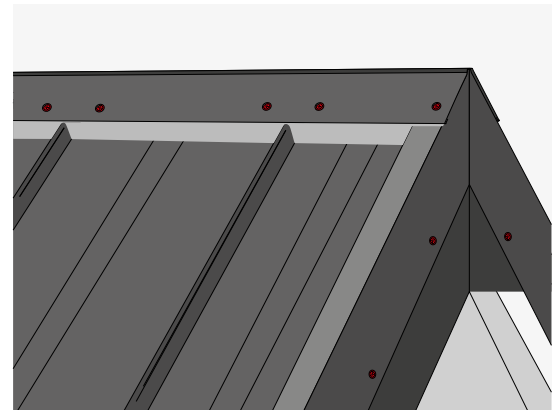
RIDGE: RIDGE TILE SHOWN INSTALLED
